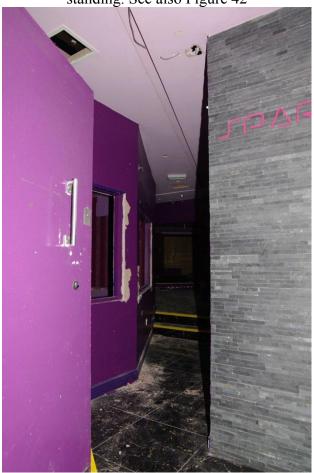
Ground floor view from doors on north-west facing elevation Looking south-east
